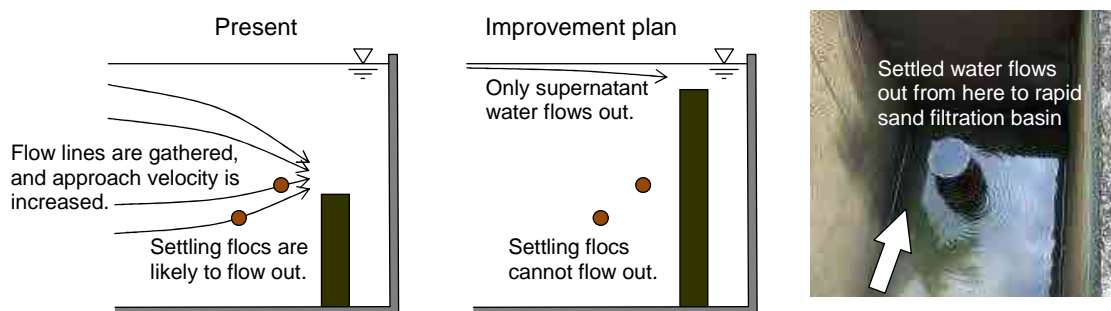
Improvement of Sedimentation Treated Water Outlet Pipe
